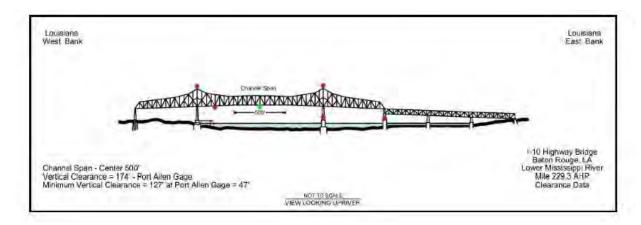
Horace Wilkinson Bridge, I-10 Bridge
